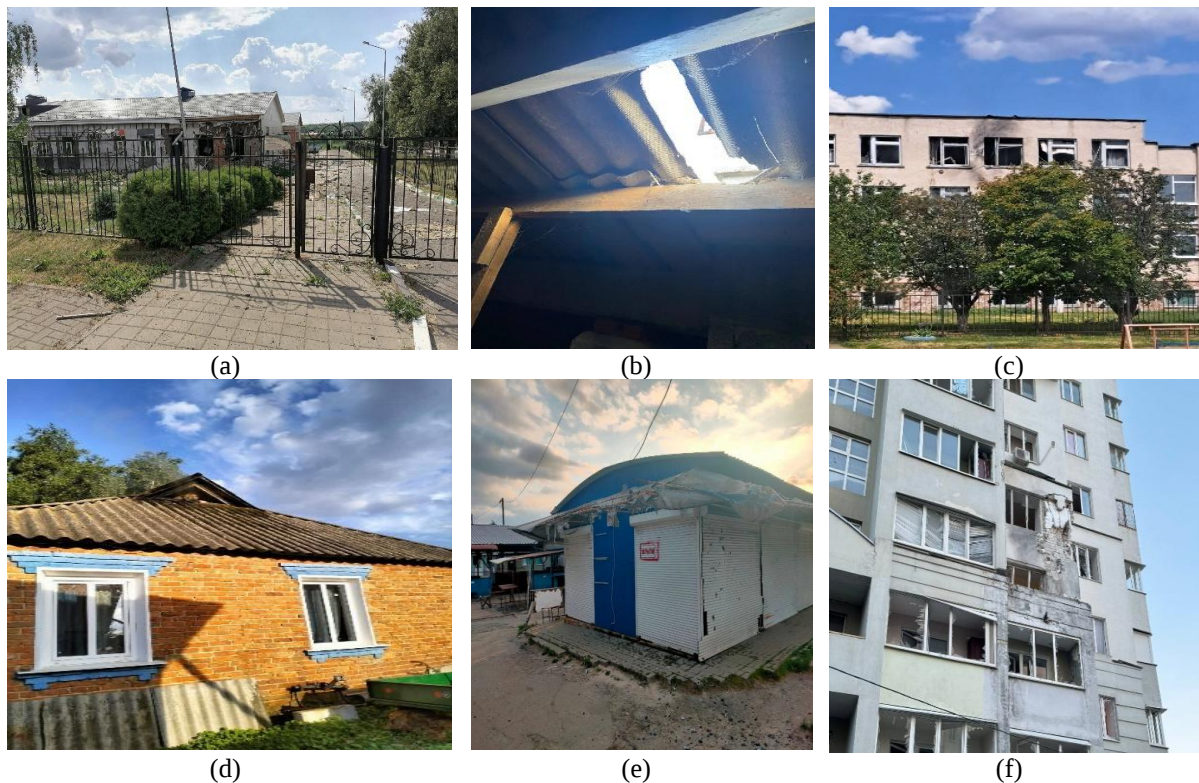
Examples of Minor Damage: a) exterior wall damage, b) roof puncture, c) facade damage, d) roof damage, e) porch damage, and f) facade damage ([Governor of Belgorod, 2024](#)).
